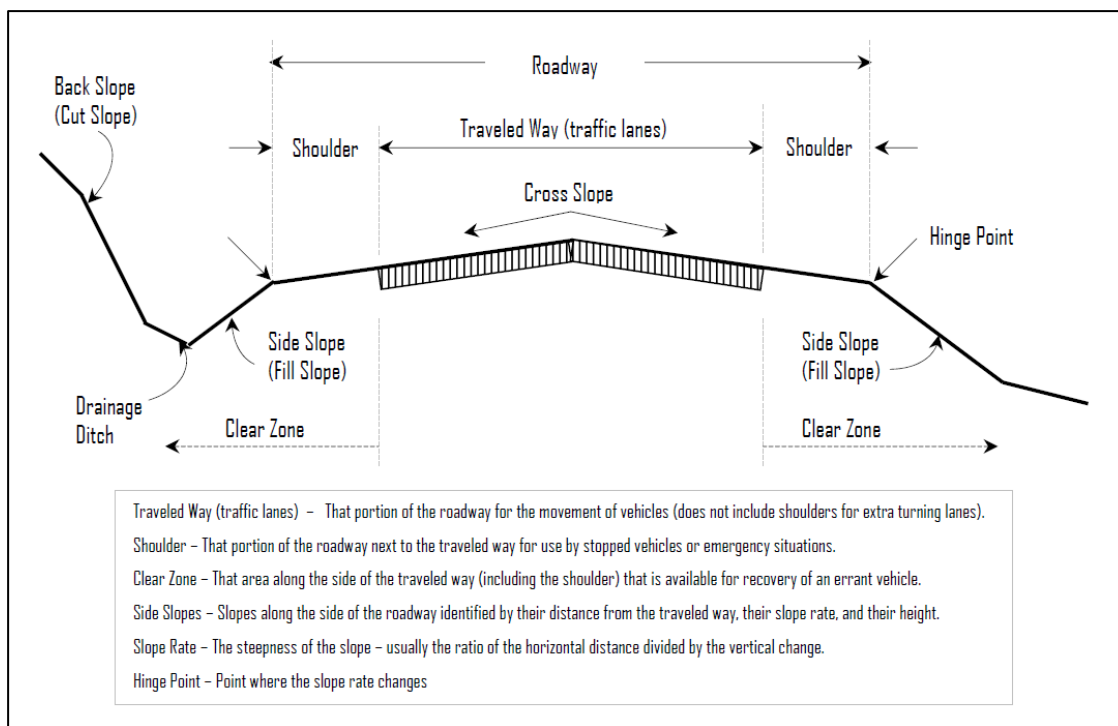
Roadway cross sectional elements, based on FHWA 1986 reported in Labi (2006).
